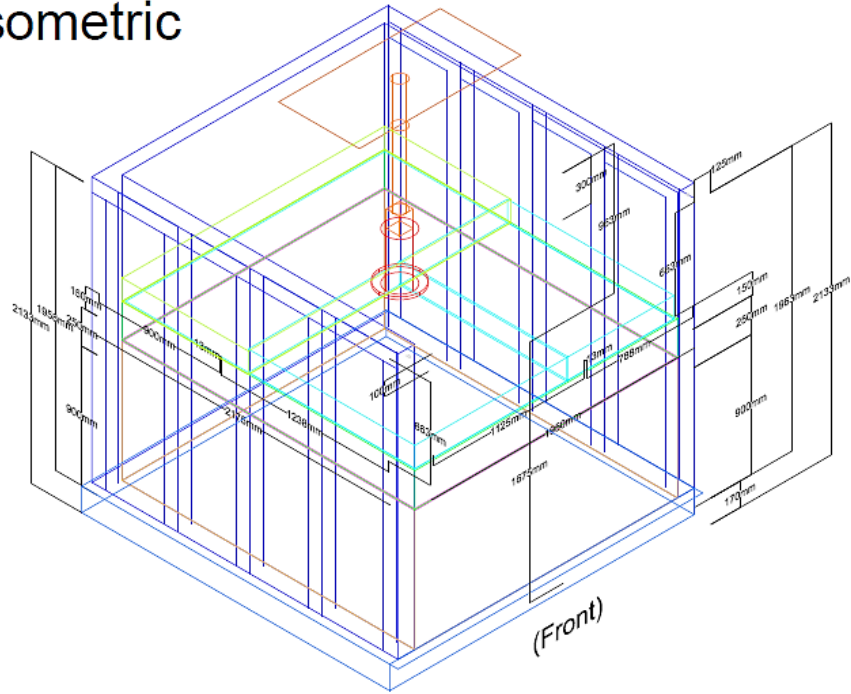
Large Box Layout with Concrete Slabs (Isometric View)
